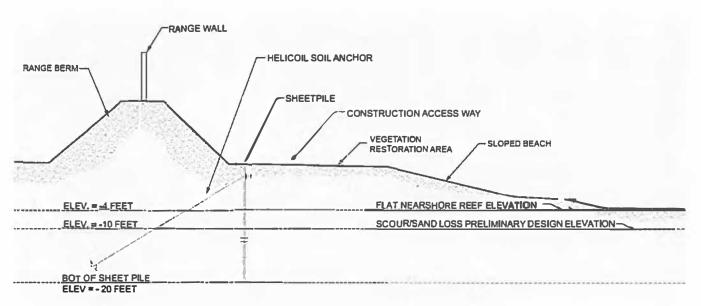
Sheet Pile Construction Conceptual Cross- Section Illustration
